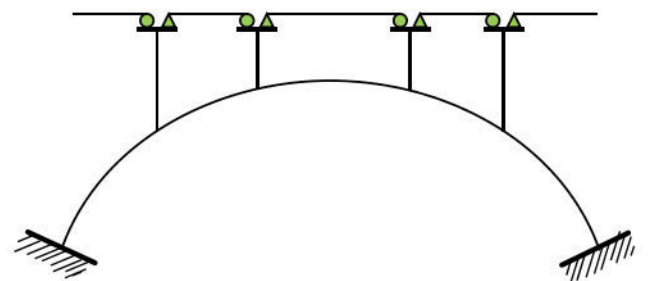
Sketch of a concrete arch bridge surmounted by concrete pylons supporting a pre-stressed concrete multispans plate girder (as bridge in figure 7).
